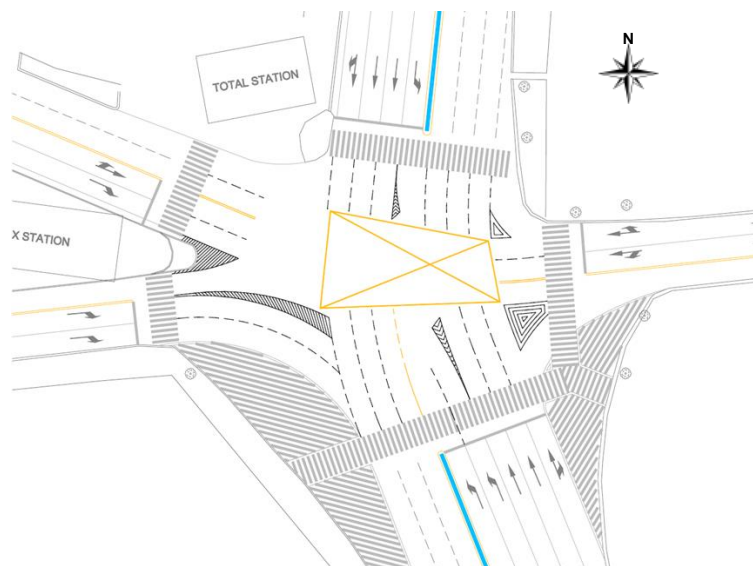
Example of Pavement Marking Inside Intersection #166
